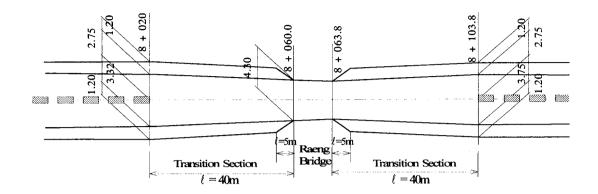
TRANSITION SECTION BEFORE AND AFTER RAENG BRIDGE
